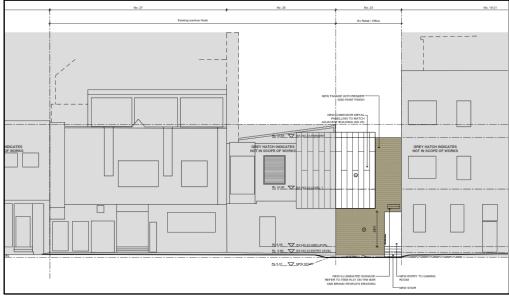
Proposed Elevation (view from Market Place) (Source: Paul Kelly Design)
